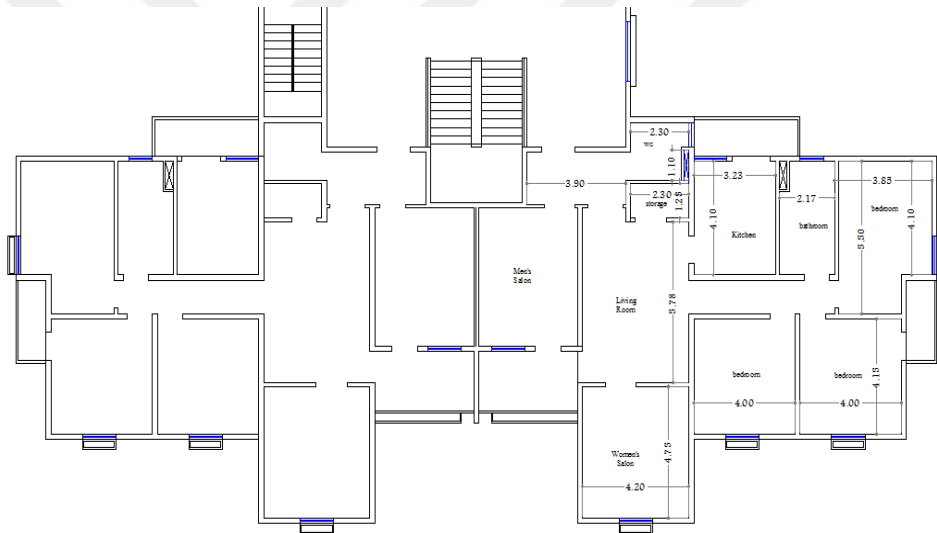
Typical Housing Units Plan Al- Hadba Khdra Housing Project
